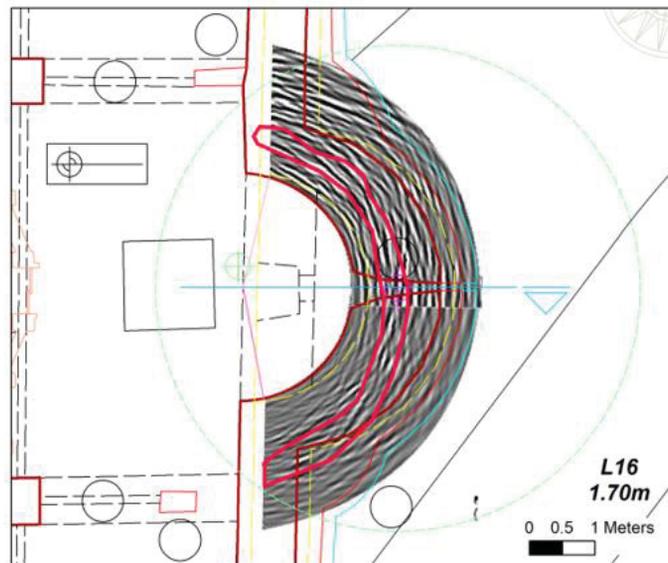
GPR cross section on a semi-circular church wall at a height equal to 1.70m above the church floor. The red rectangle annotates a reflection possibly caused by a vertical internal surface within the wall structure. This reflection is seen in all the cross sectional GPR images collected on this wall.
